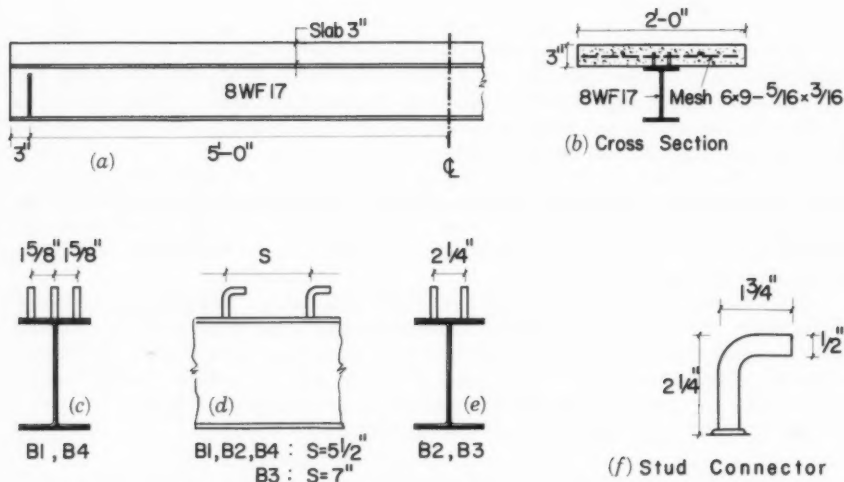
DIMENSIONS OF TEST SPECIMENS
